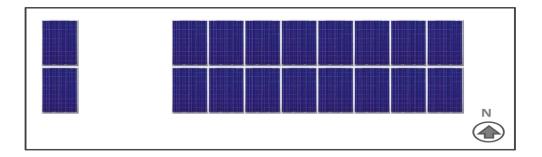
Top View of Panels on Front Building (Drawn by author)
